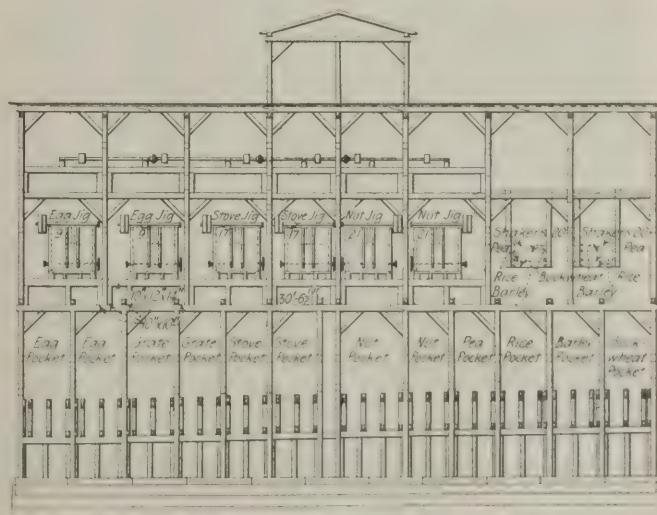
CROSS-SECTION SHOWING SHAKERS, JIGS AND POCKETS
